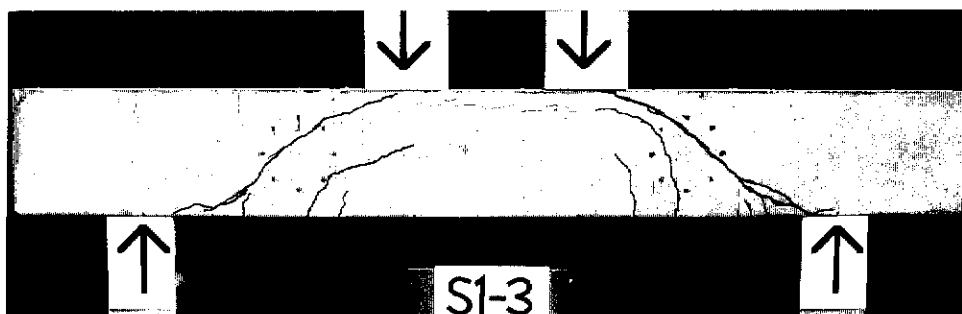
Crack Pattern of the Front Face of Beam S1-3
